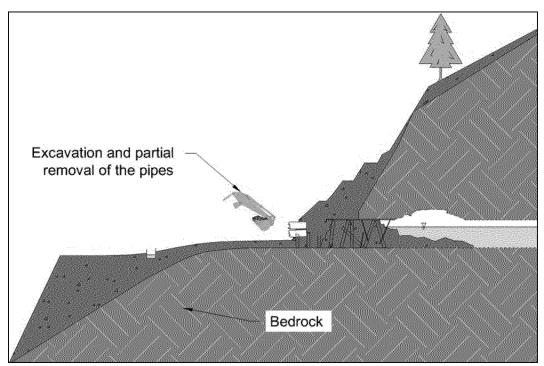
Cross-section showing the condition of the Gold King Mine New Adit in 2014 (water level as assumed by EPA and DRMS) after the excavation shown in figure 23 was complete (not to scale).
